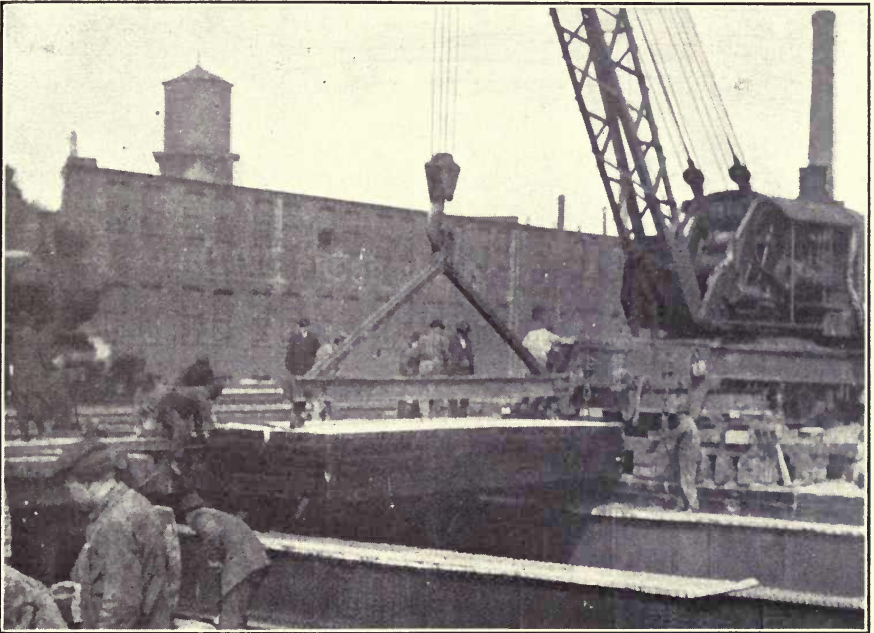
SETTING CONCRETE SLABS, C., B. & Q. R. R. TRACK ELEVATION.
